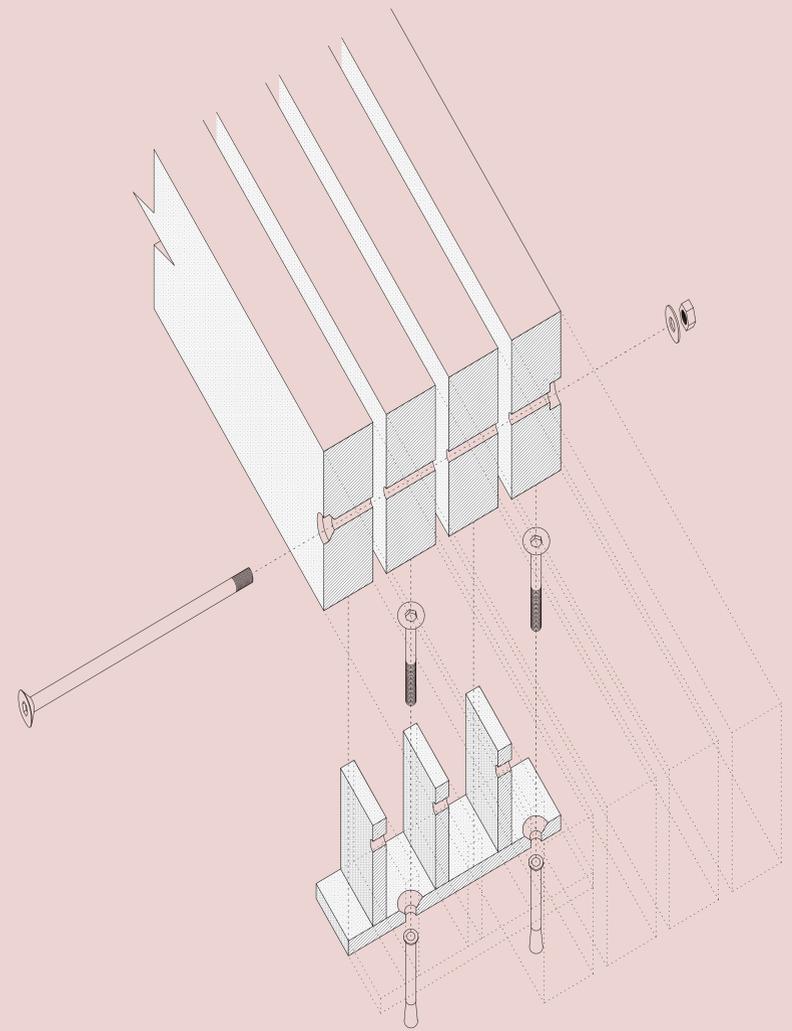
Exploded Axonometric Detail, Reversible Timber Construction, St. John Walsh / AY Architects
